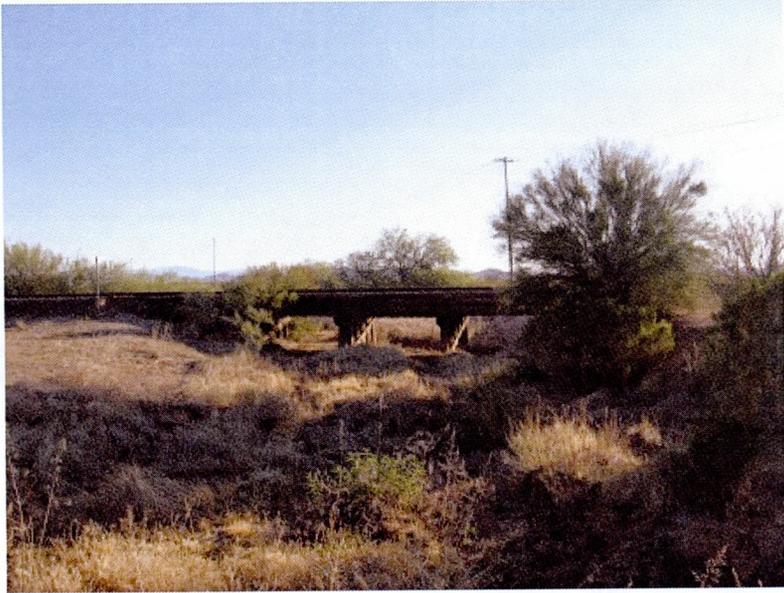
Looking Northwest to Railroad trestle on the north side of US 60.
